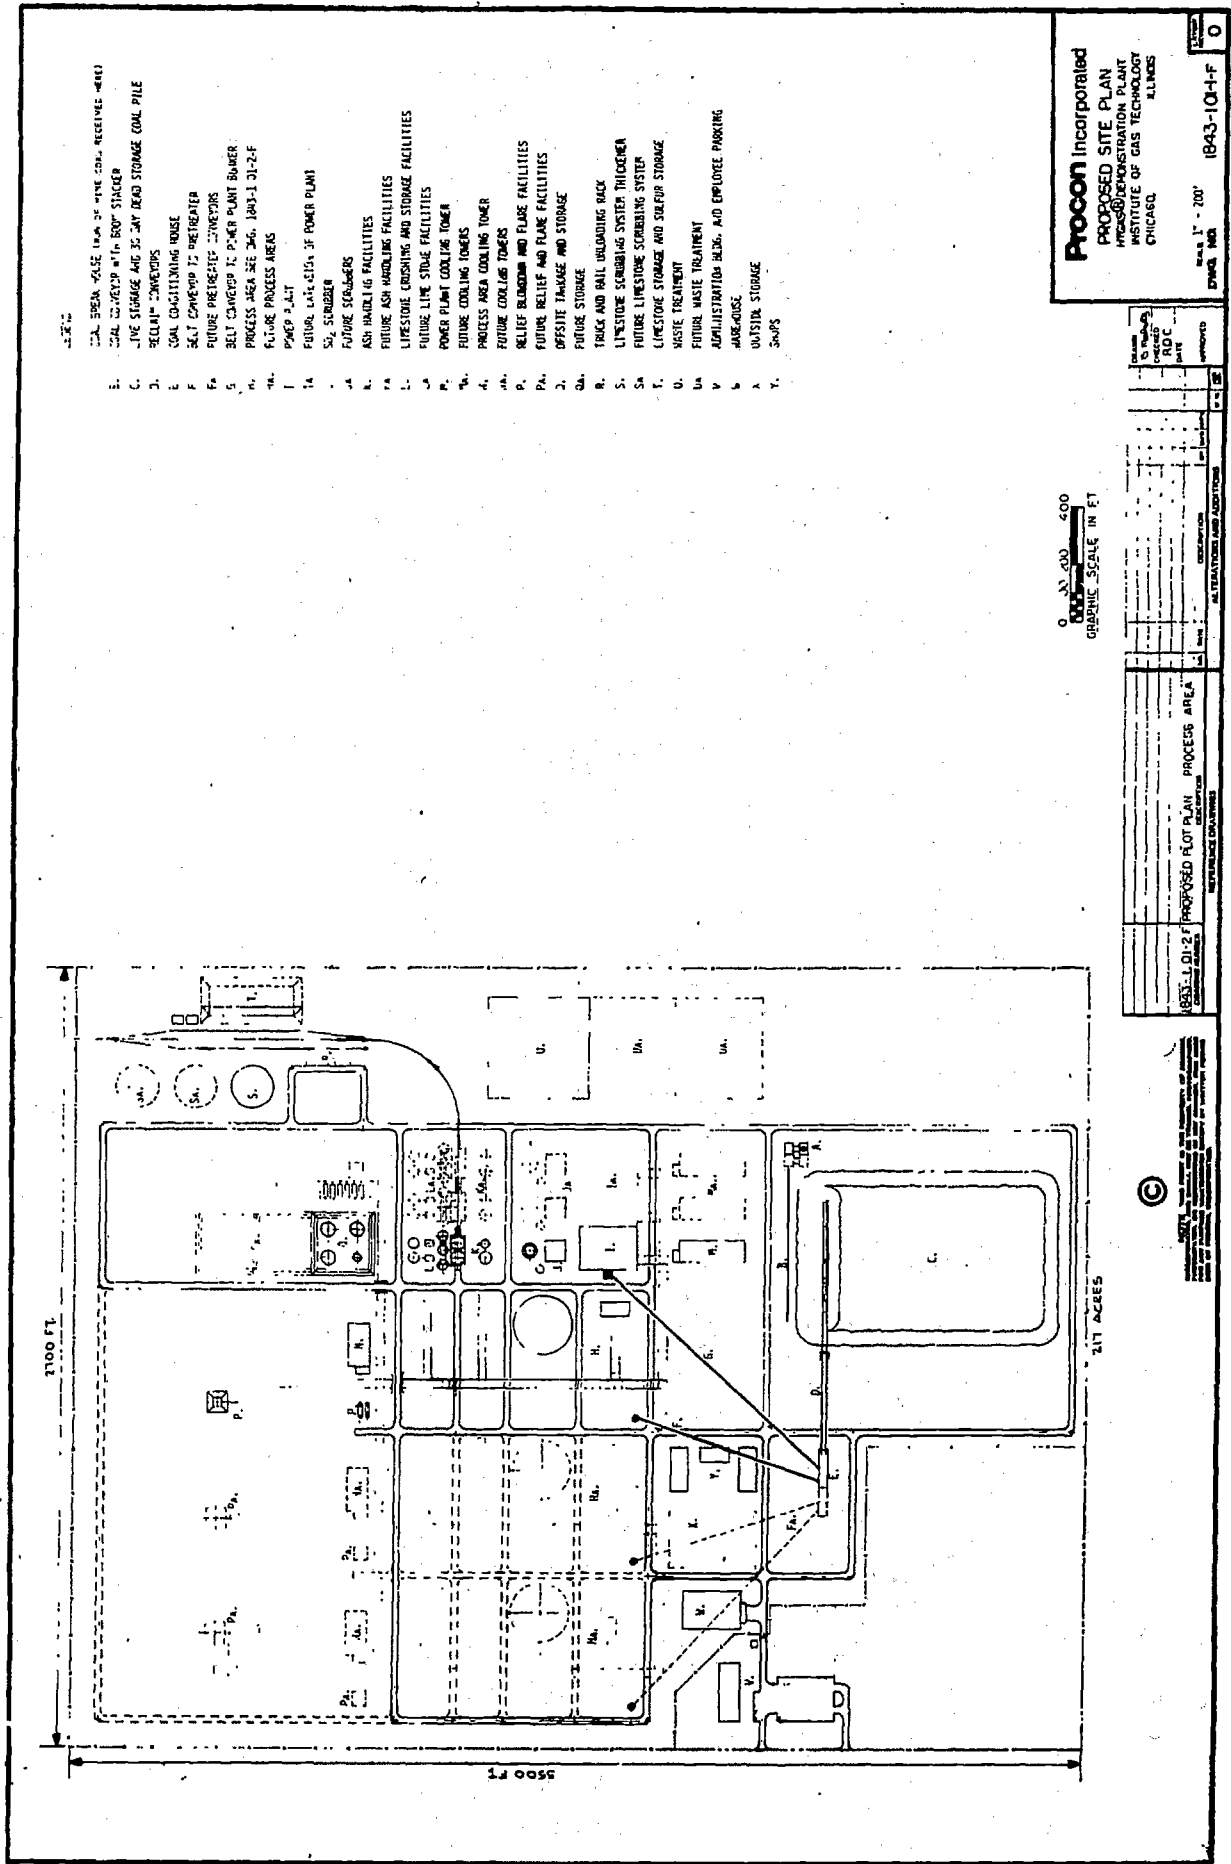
PROPOSED DEMONSTRATION PLANT SITE PLAN
